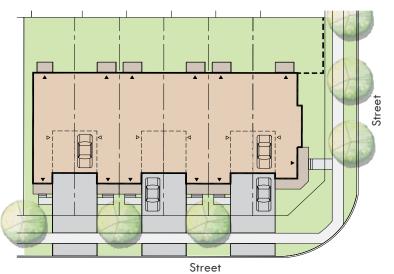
Conceptual Siting of Street Townhouses
